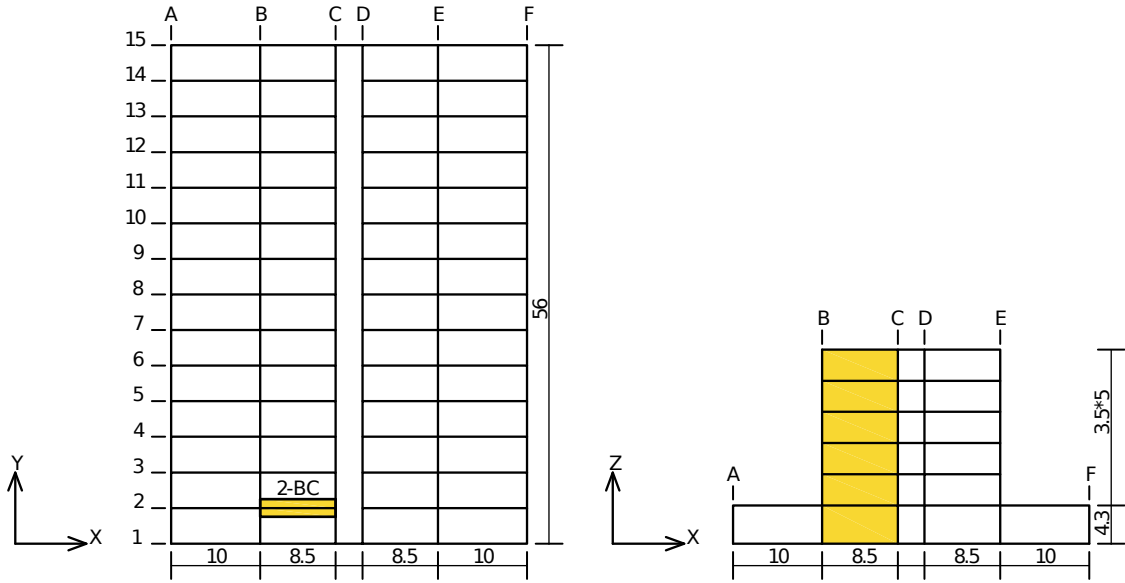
Plan view and the elevation of a typical 6-storey CLT building. Wall 2-BC, shown yellow in the figure, is selected for subsequent analyses. Units in [m].
